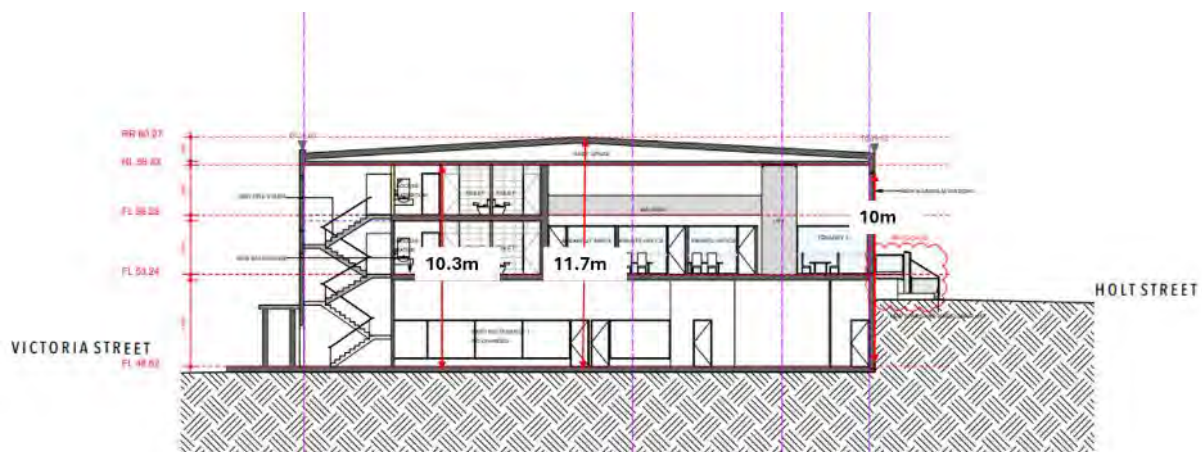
Annotated Proposed Section D-D with details of height of works and height of existing building
